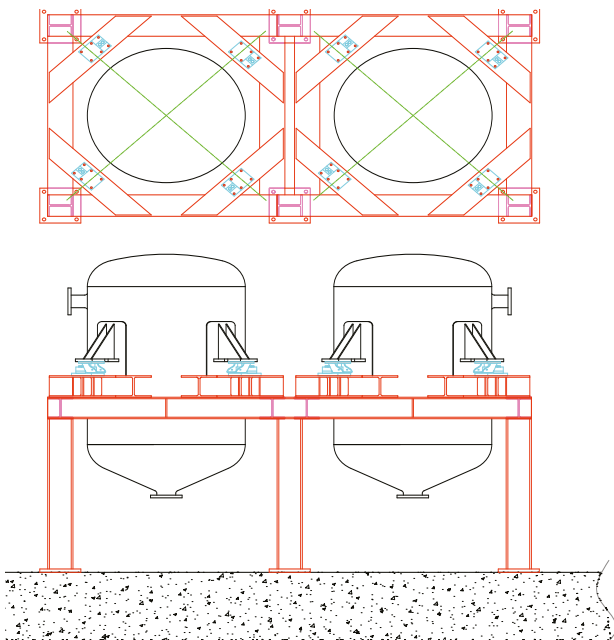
, Tanks mounted on horizontal beams near vertical columns
